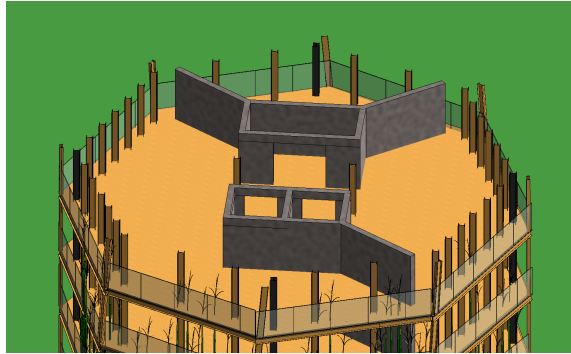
Illustration of the plan section, shown by octagon tapered and twisted in Revit
